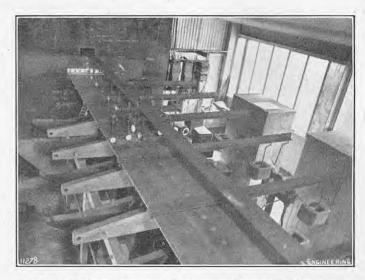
Test Specimen, Loaded to Prevent Twisting.
